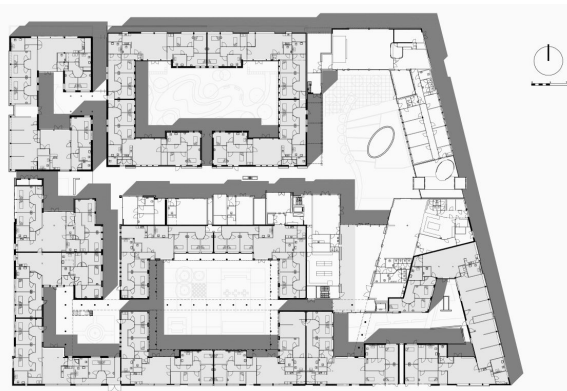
Ground floor plan. Copyright The Hogeweyk.
